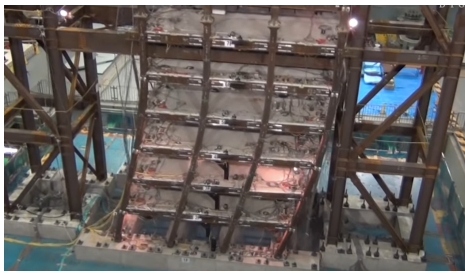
Yielding and collapse of an 18-story steel frame building (containing geometric nonlinearity due to the large deformation) [Video #4]
